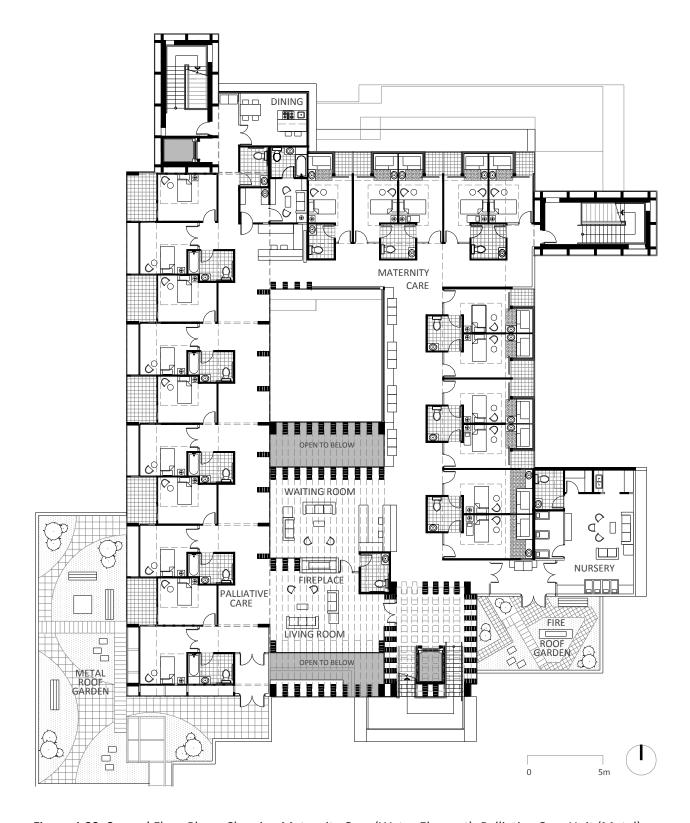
Second Floor Plan – Showing Maternity Care (Water Element); Palliative Care Unit (Metal);
